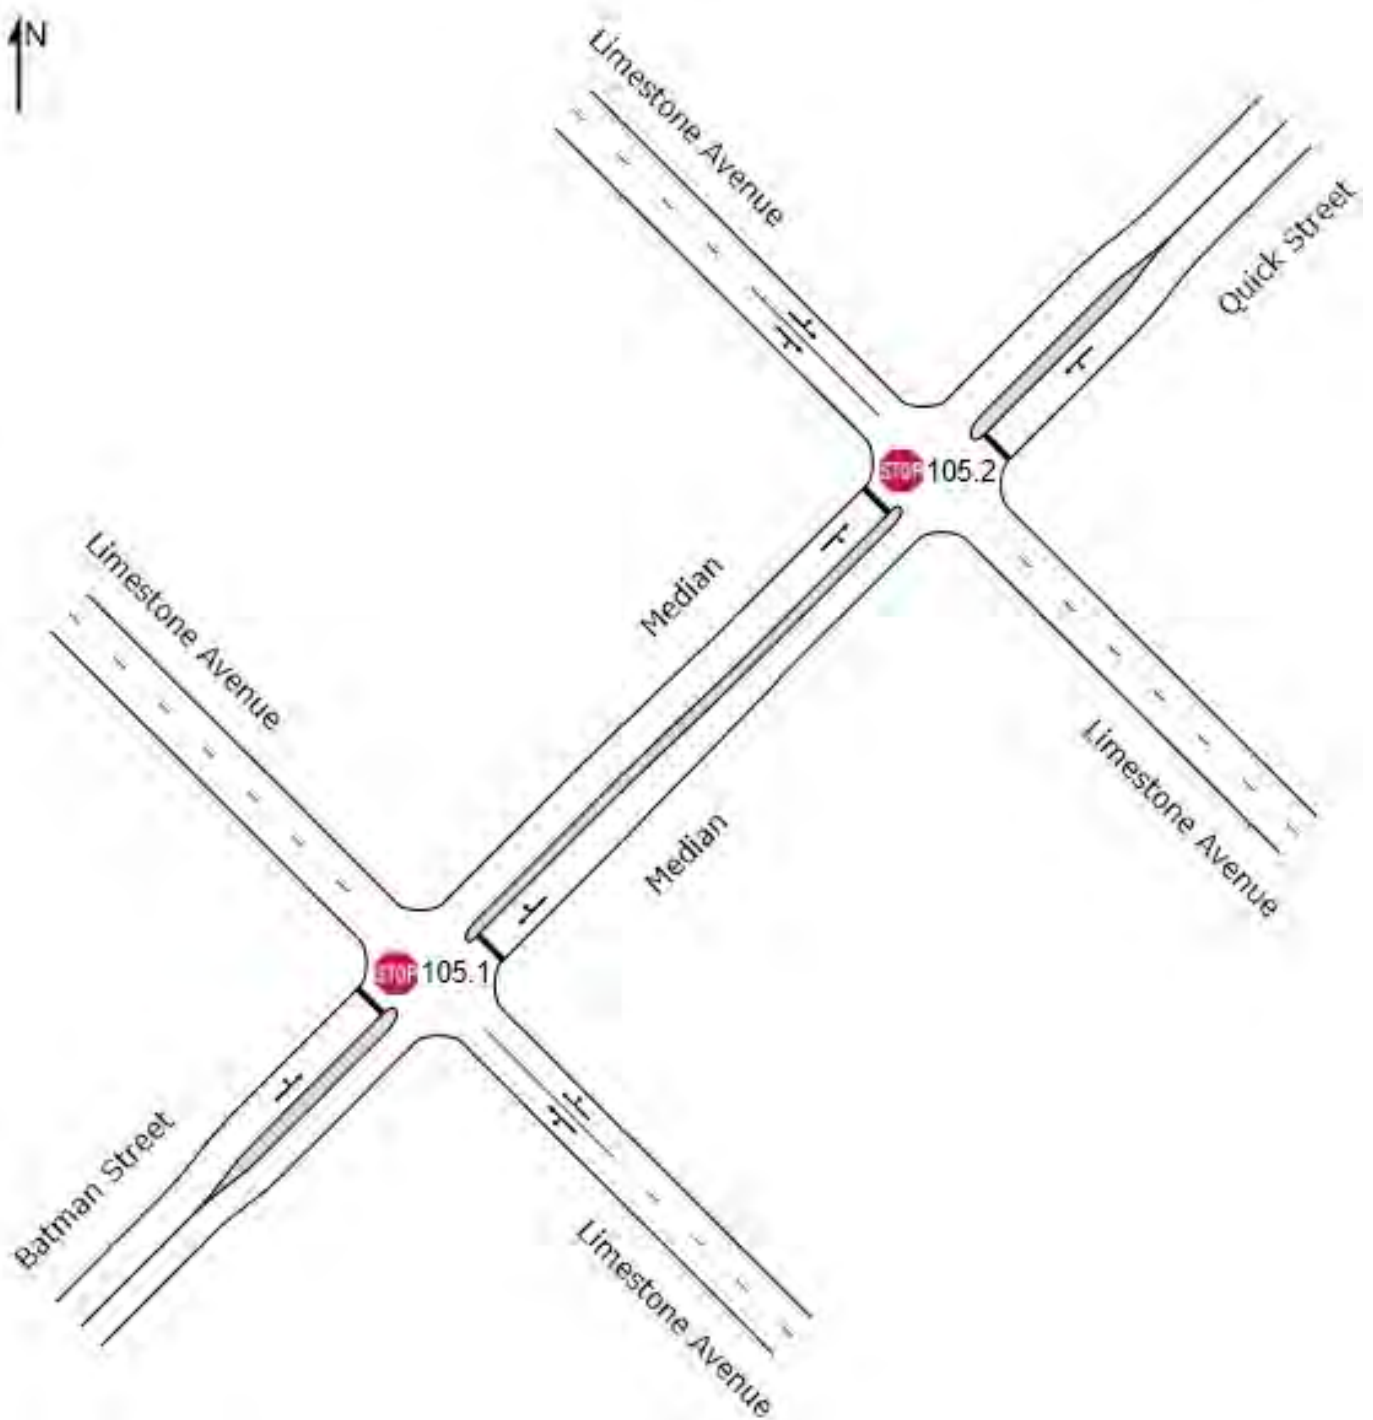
Current Intersection Layout –Limestone Avenue / Quick Street / Batman Street
